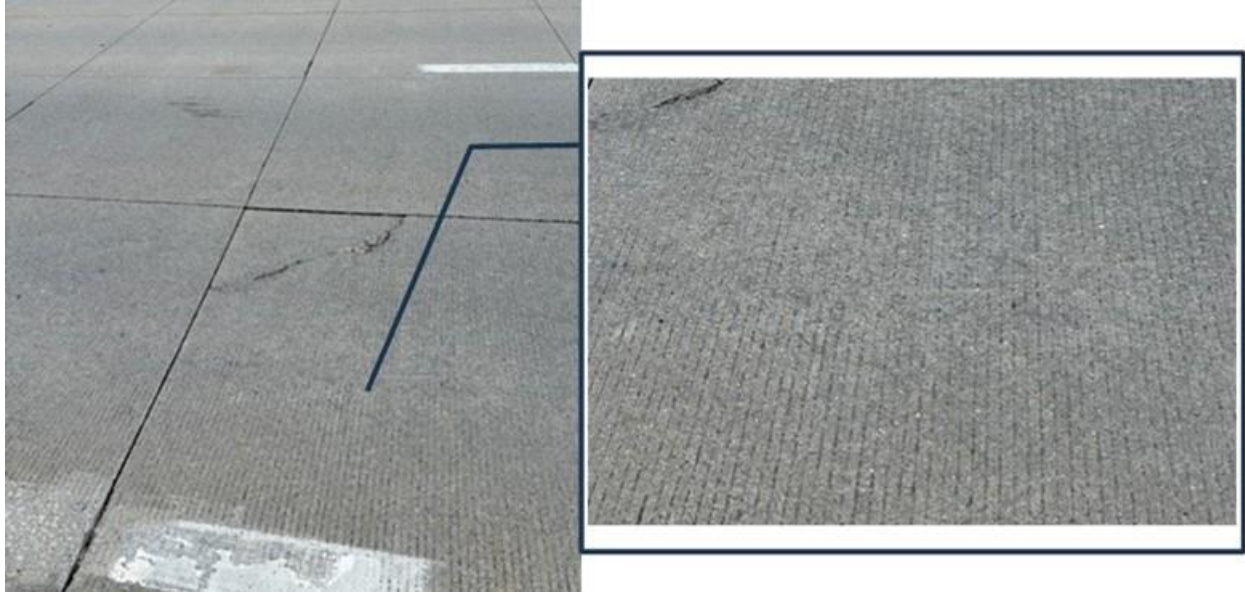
Pavement Surface Condition for Unbonded Concrete Overlay in 2025
